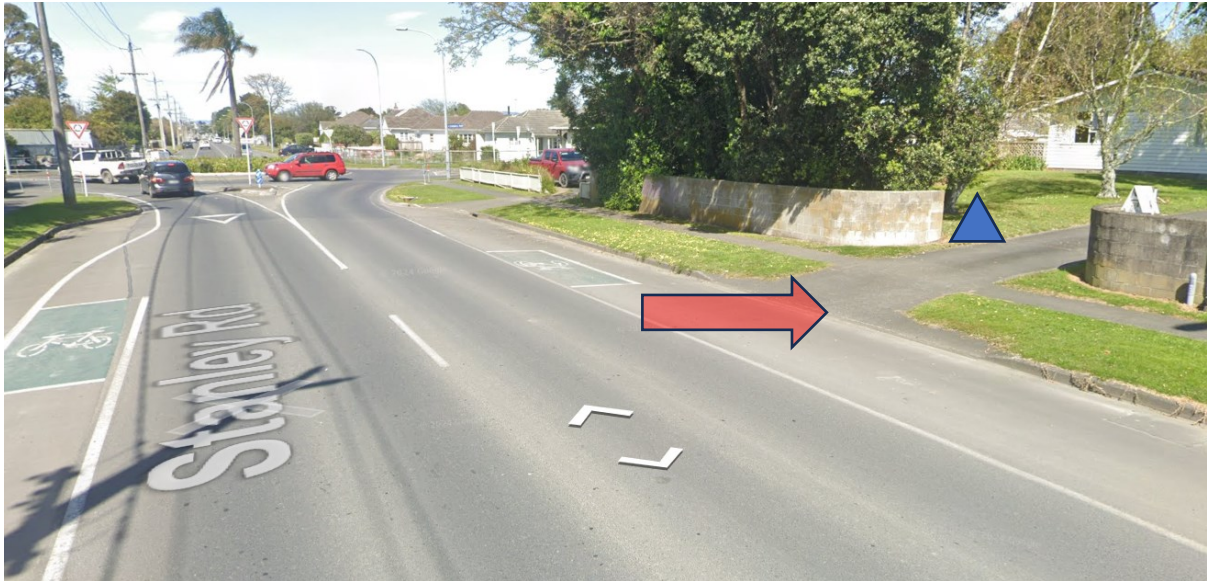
Facing south: Google Streetview image showing 99a Stanley Road vehicle crossing (red arrow) proximity to Childers Road intersection. Blue triangle shows proposed Lot 1 vehicle entrance.
